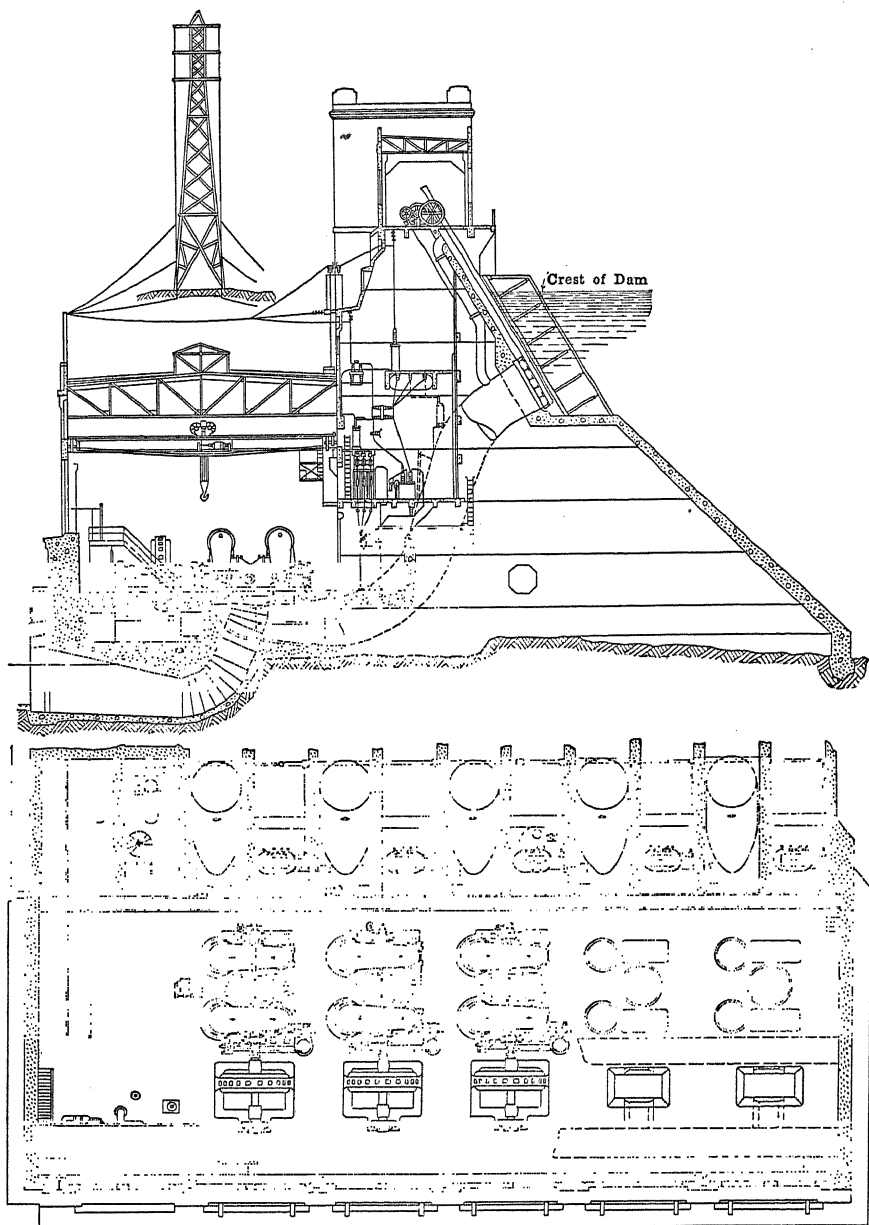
Bulkhead Section and Plan of Dam and Power House of Estacada Plant of Portland (Ore.) Railway Light and Power Company on Clackamas River
